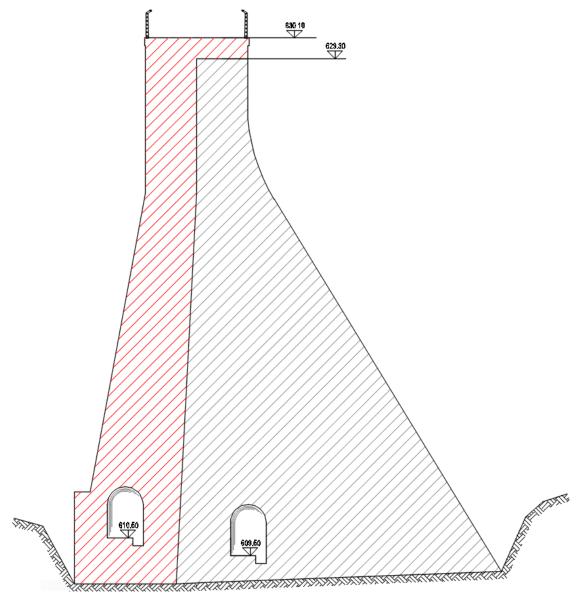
Cross section type of the dam: the new gravity blocks are highlighted in red
